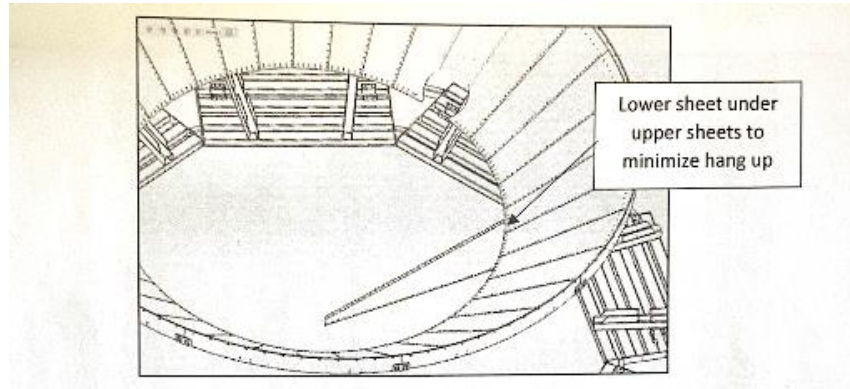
Raise ring and upper sheets, and start attaching lower cone sheets
